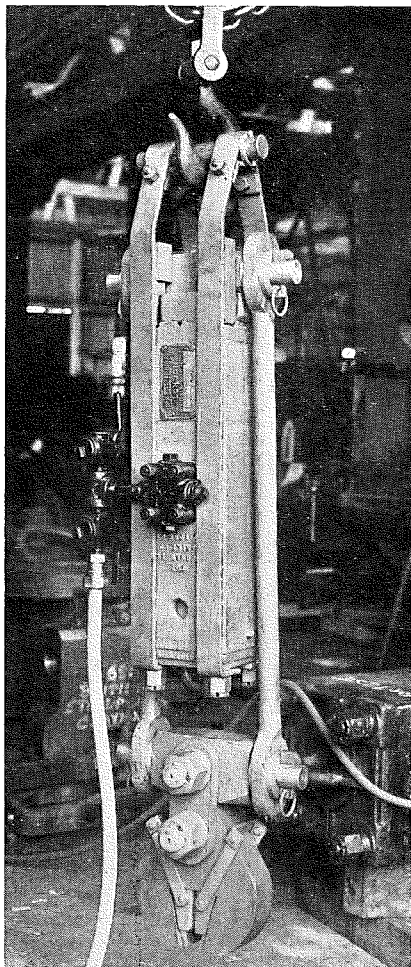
DOUBLE-ACTING STEAM HAMMER INVERTED FOR EXTRACTING SHEET PILES.
